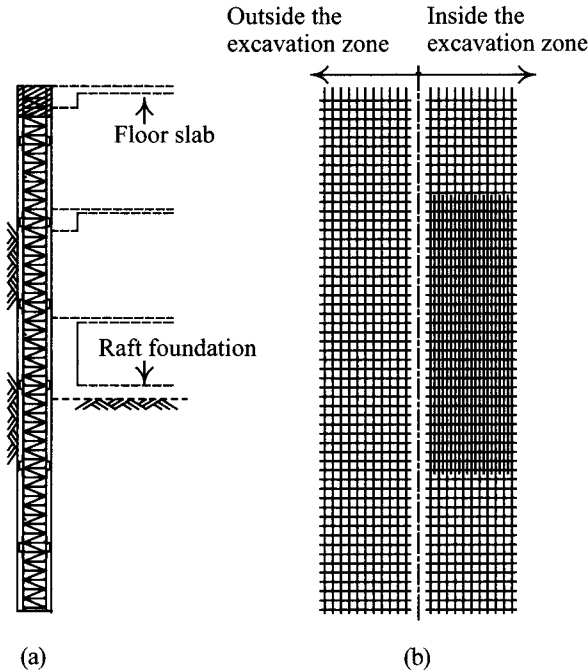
Design of reinforcements in a steel cage of the diaphragm wall: (a) profile and (b) side view.
